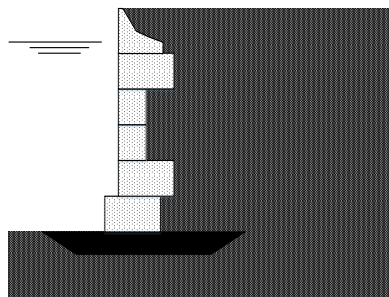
(a) provides a cross section of a cast in place concrete or masonry wall, these walls are built in a dry environment which is created through the construction of a cofferdam that is then pumped dry. The primary advantage of this technique is that construction of the wall is completed using standard construction techniques which results in a better quality final structure. The disadvantage is that the construction of the cofferdam is very expensive. As a result this technique is most suitable where a short section of cofferdam wall is required to be constructed to allow for a large dry area behind the wall. An alternative method is that the entire port basin is excavated in a dry environment before being opened up to the ocean.
